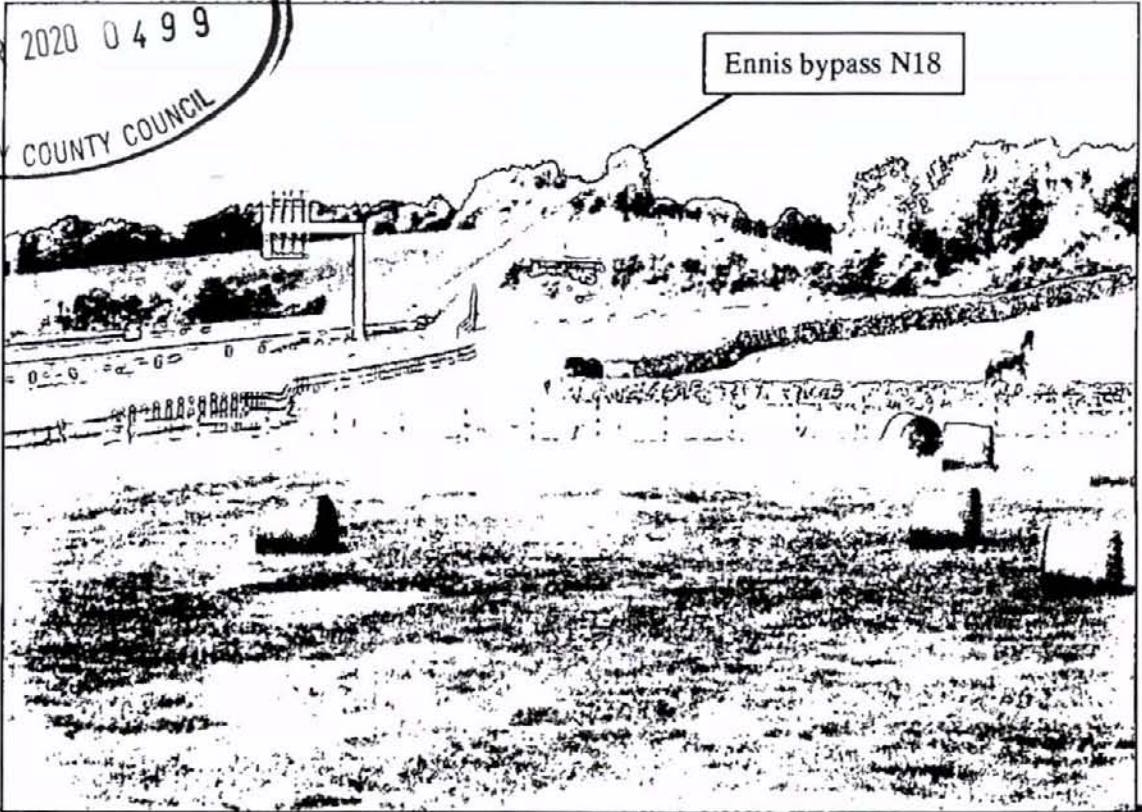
Rock quarry reinstated with drystone wall. The Ennis bypass runs to the left of the site.
